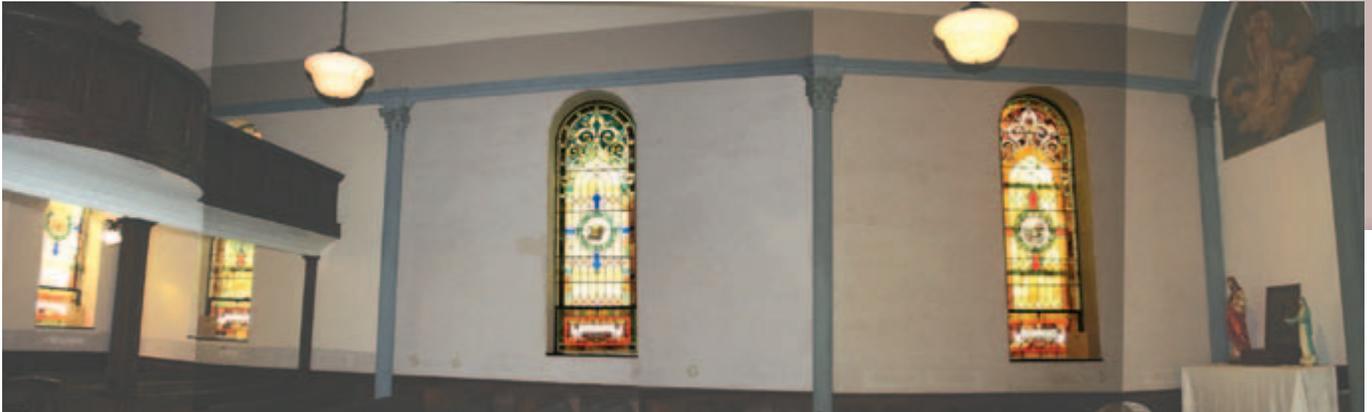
North Interior Elevation (South Interior Elevation Similar)
